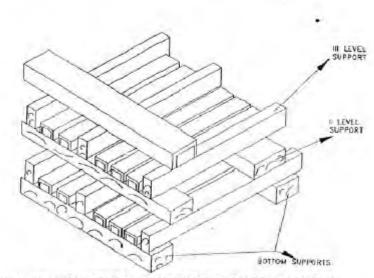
STRUCTURAL STEEL STACKING ARRANGEMENT
